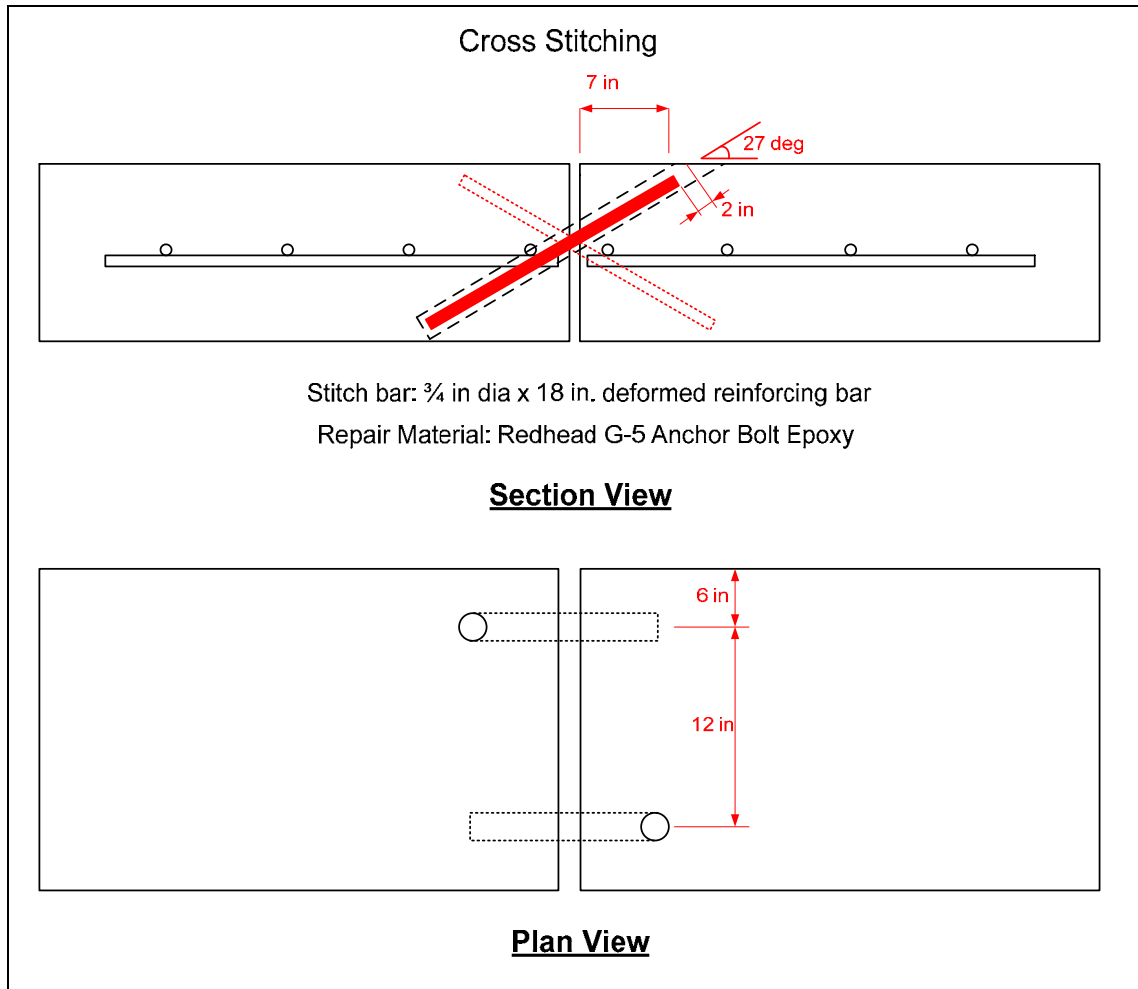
Cross Stitch Shear Specimen Before Casting
